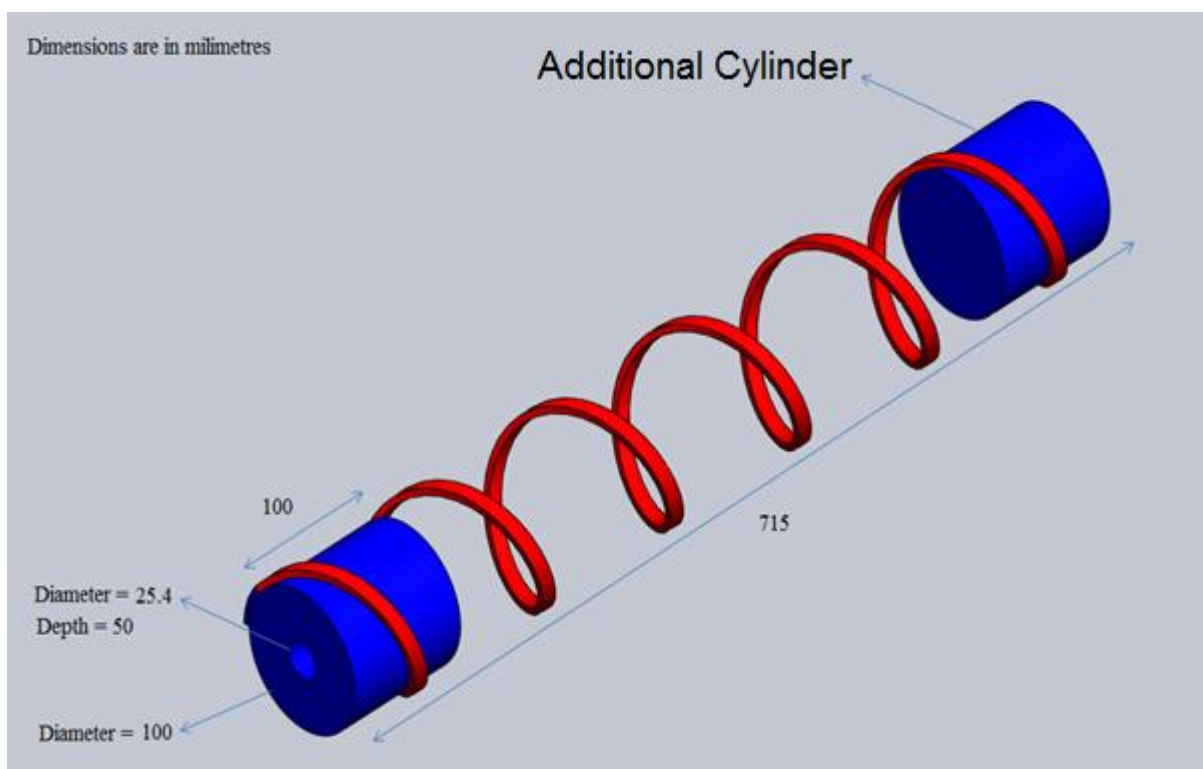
Single Tendon assembly for dead loading test 3D view
